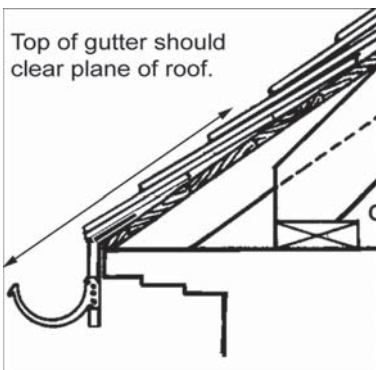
Ideally, the outer edge of external rain gutters should be hung below the plane of the roof to prevent damage to the gutters from sliding ice and snow.
